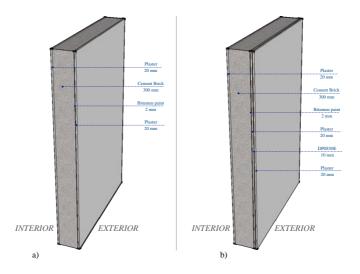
3-D sections illustrate a) the layers in typical Qatari houses and b) how to locate the proposed material in existing houses.
